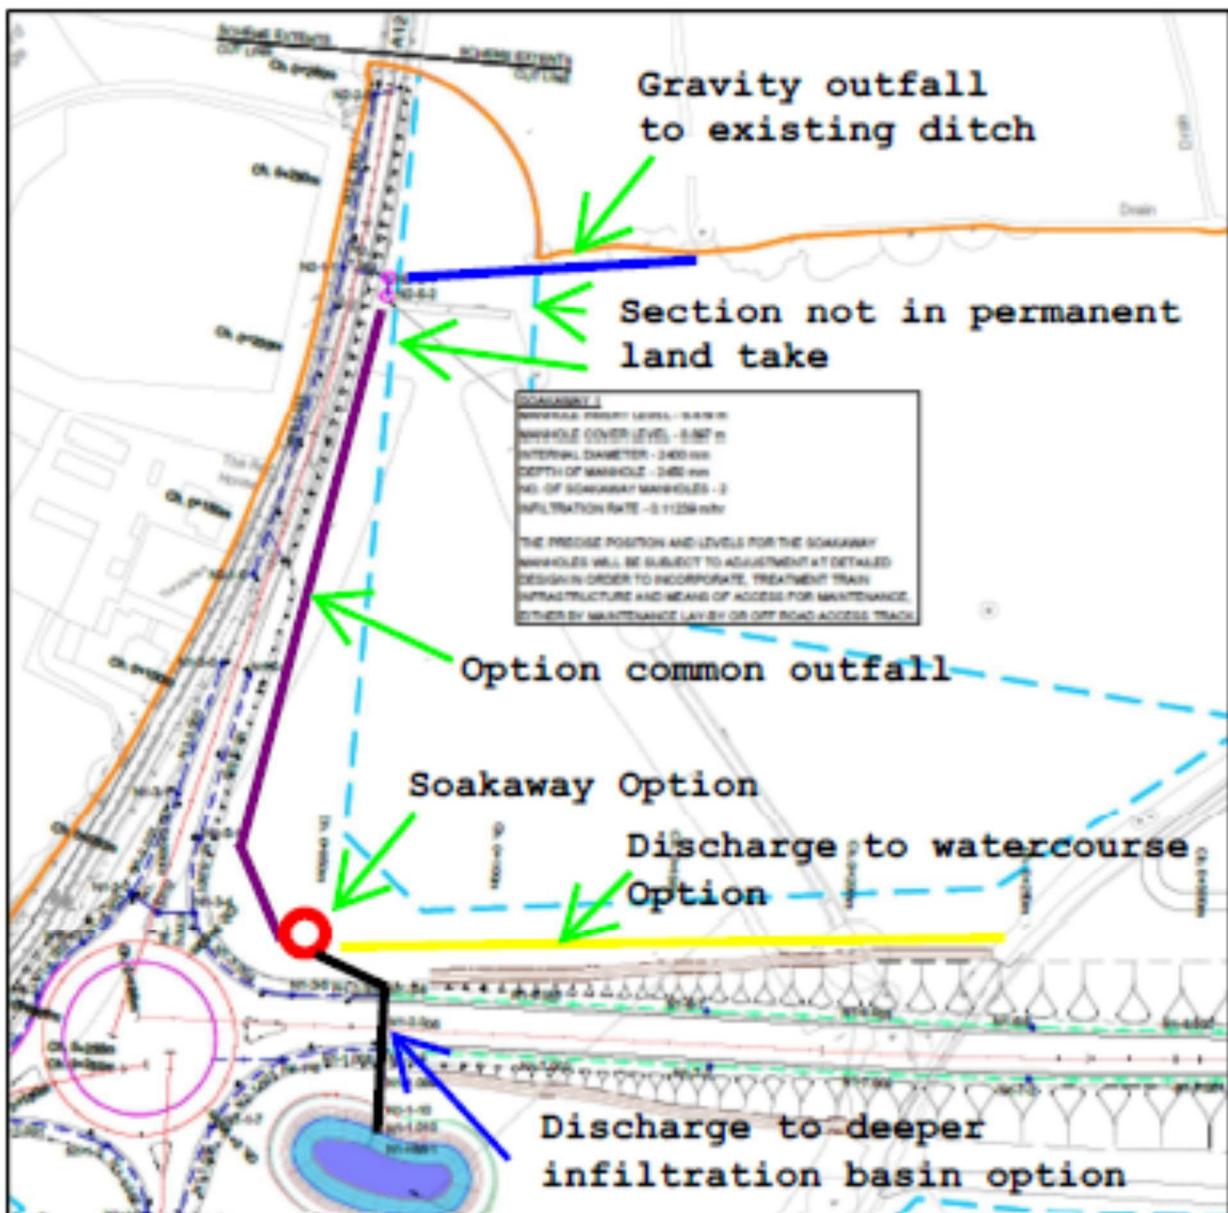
A12 west roundabout northern arm with soakaway manhole location
